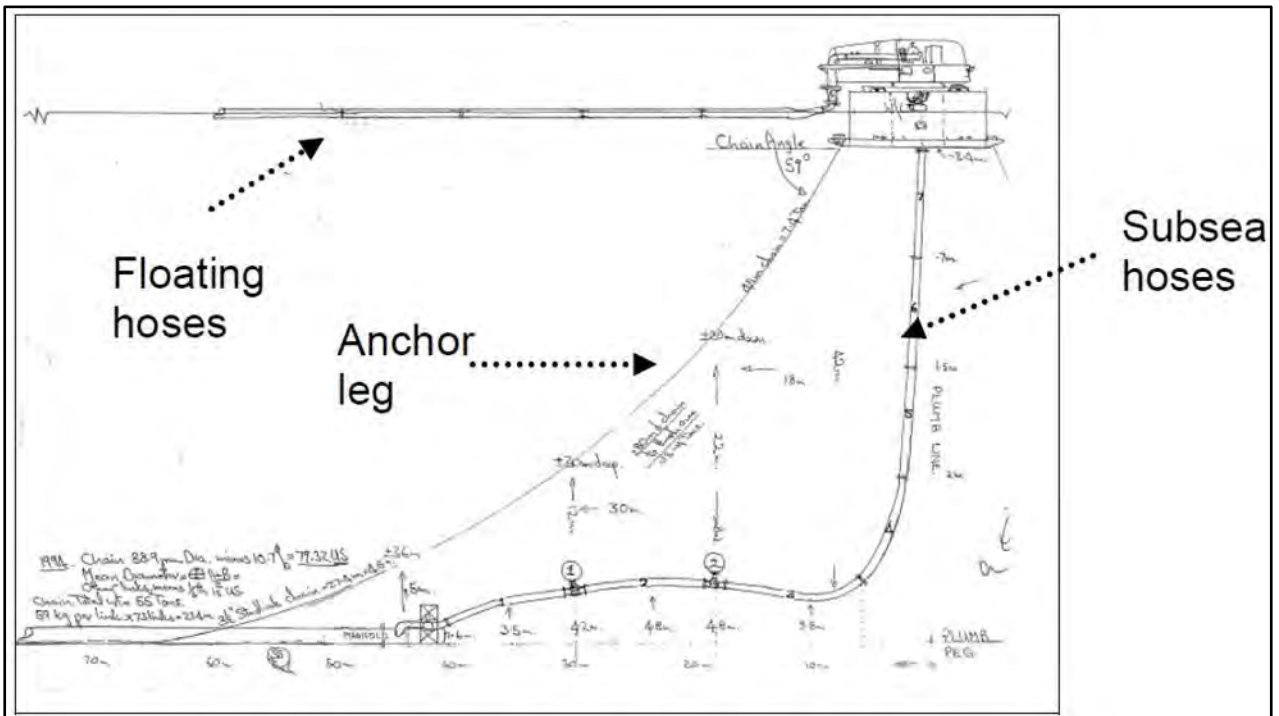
PLEM and Anchor Leg General Arrangement (SAPREF 2019)
